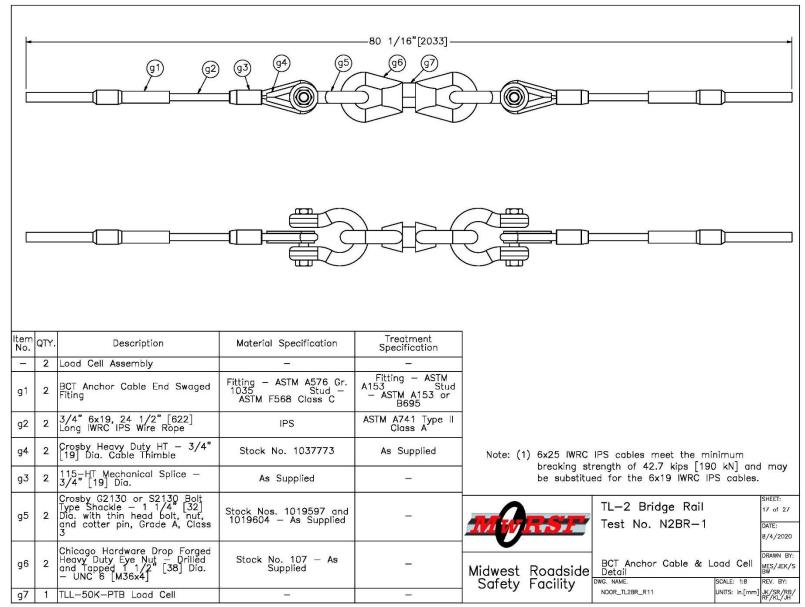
BCT Anchor Cable and Load Cell Detail, Test No. N2BR-1
